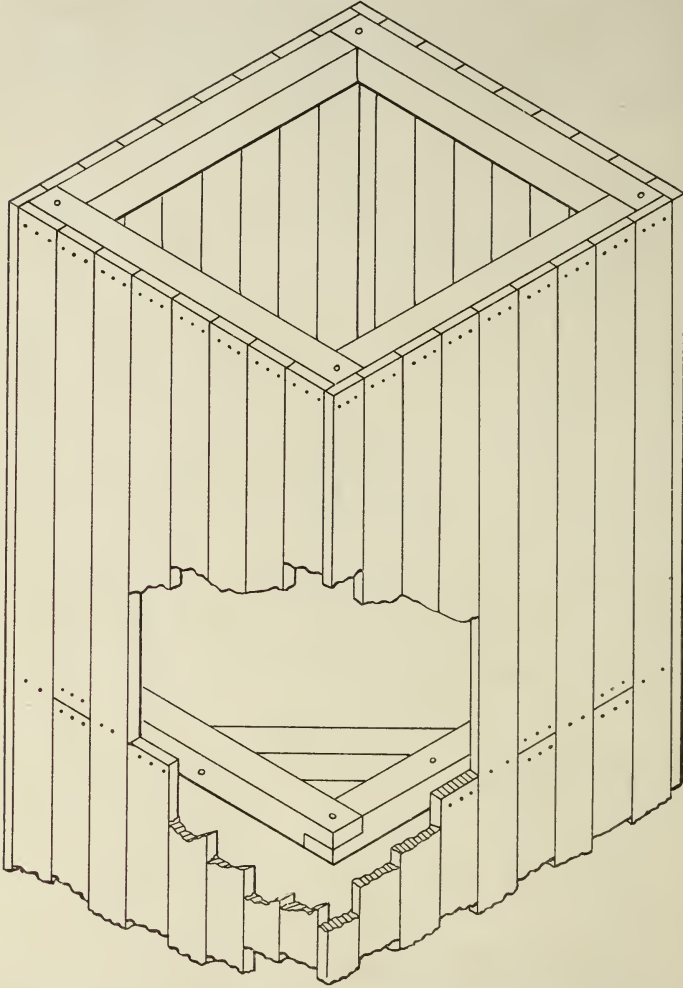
Detail of wood-framed well cribbing, showing the breaking of joints on the vertical planks, and the strong inner bracing.
